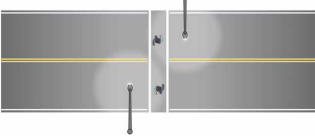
Drawing. New design for midblock crosswalk lighting layout.
